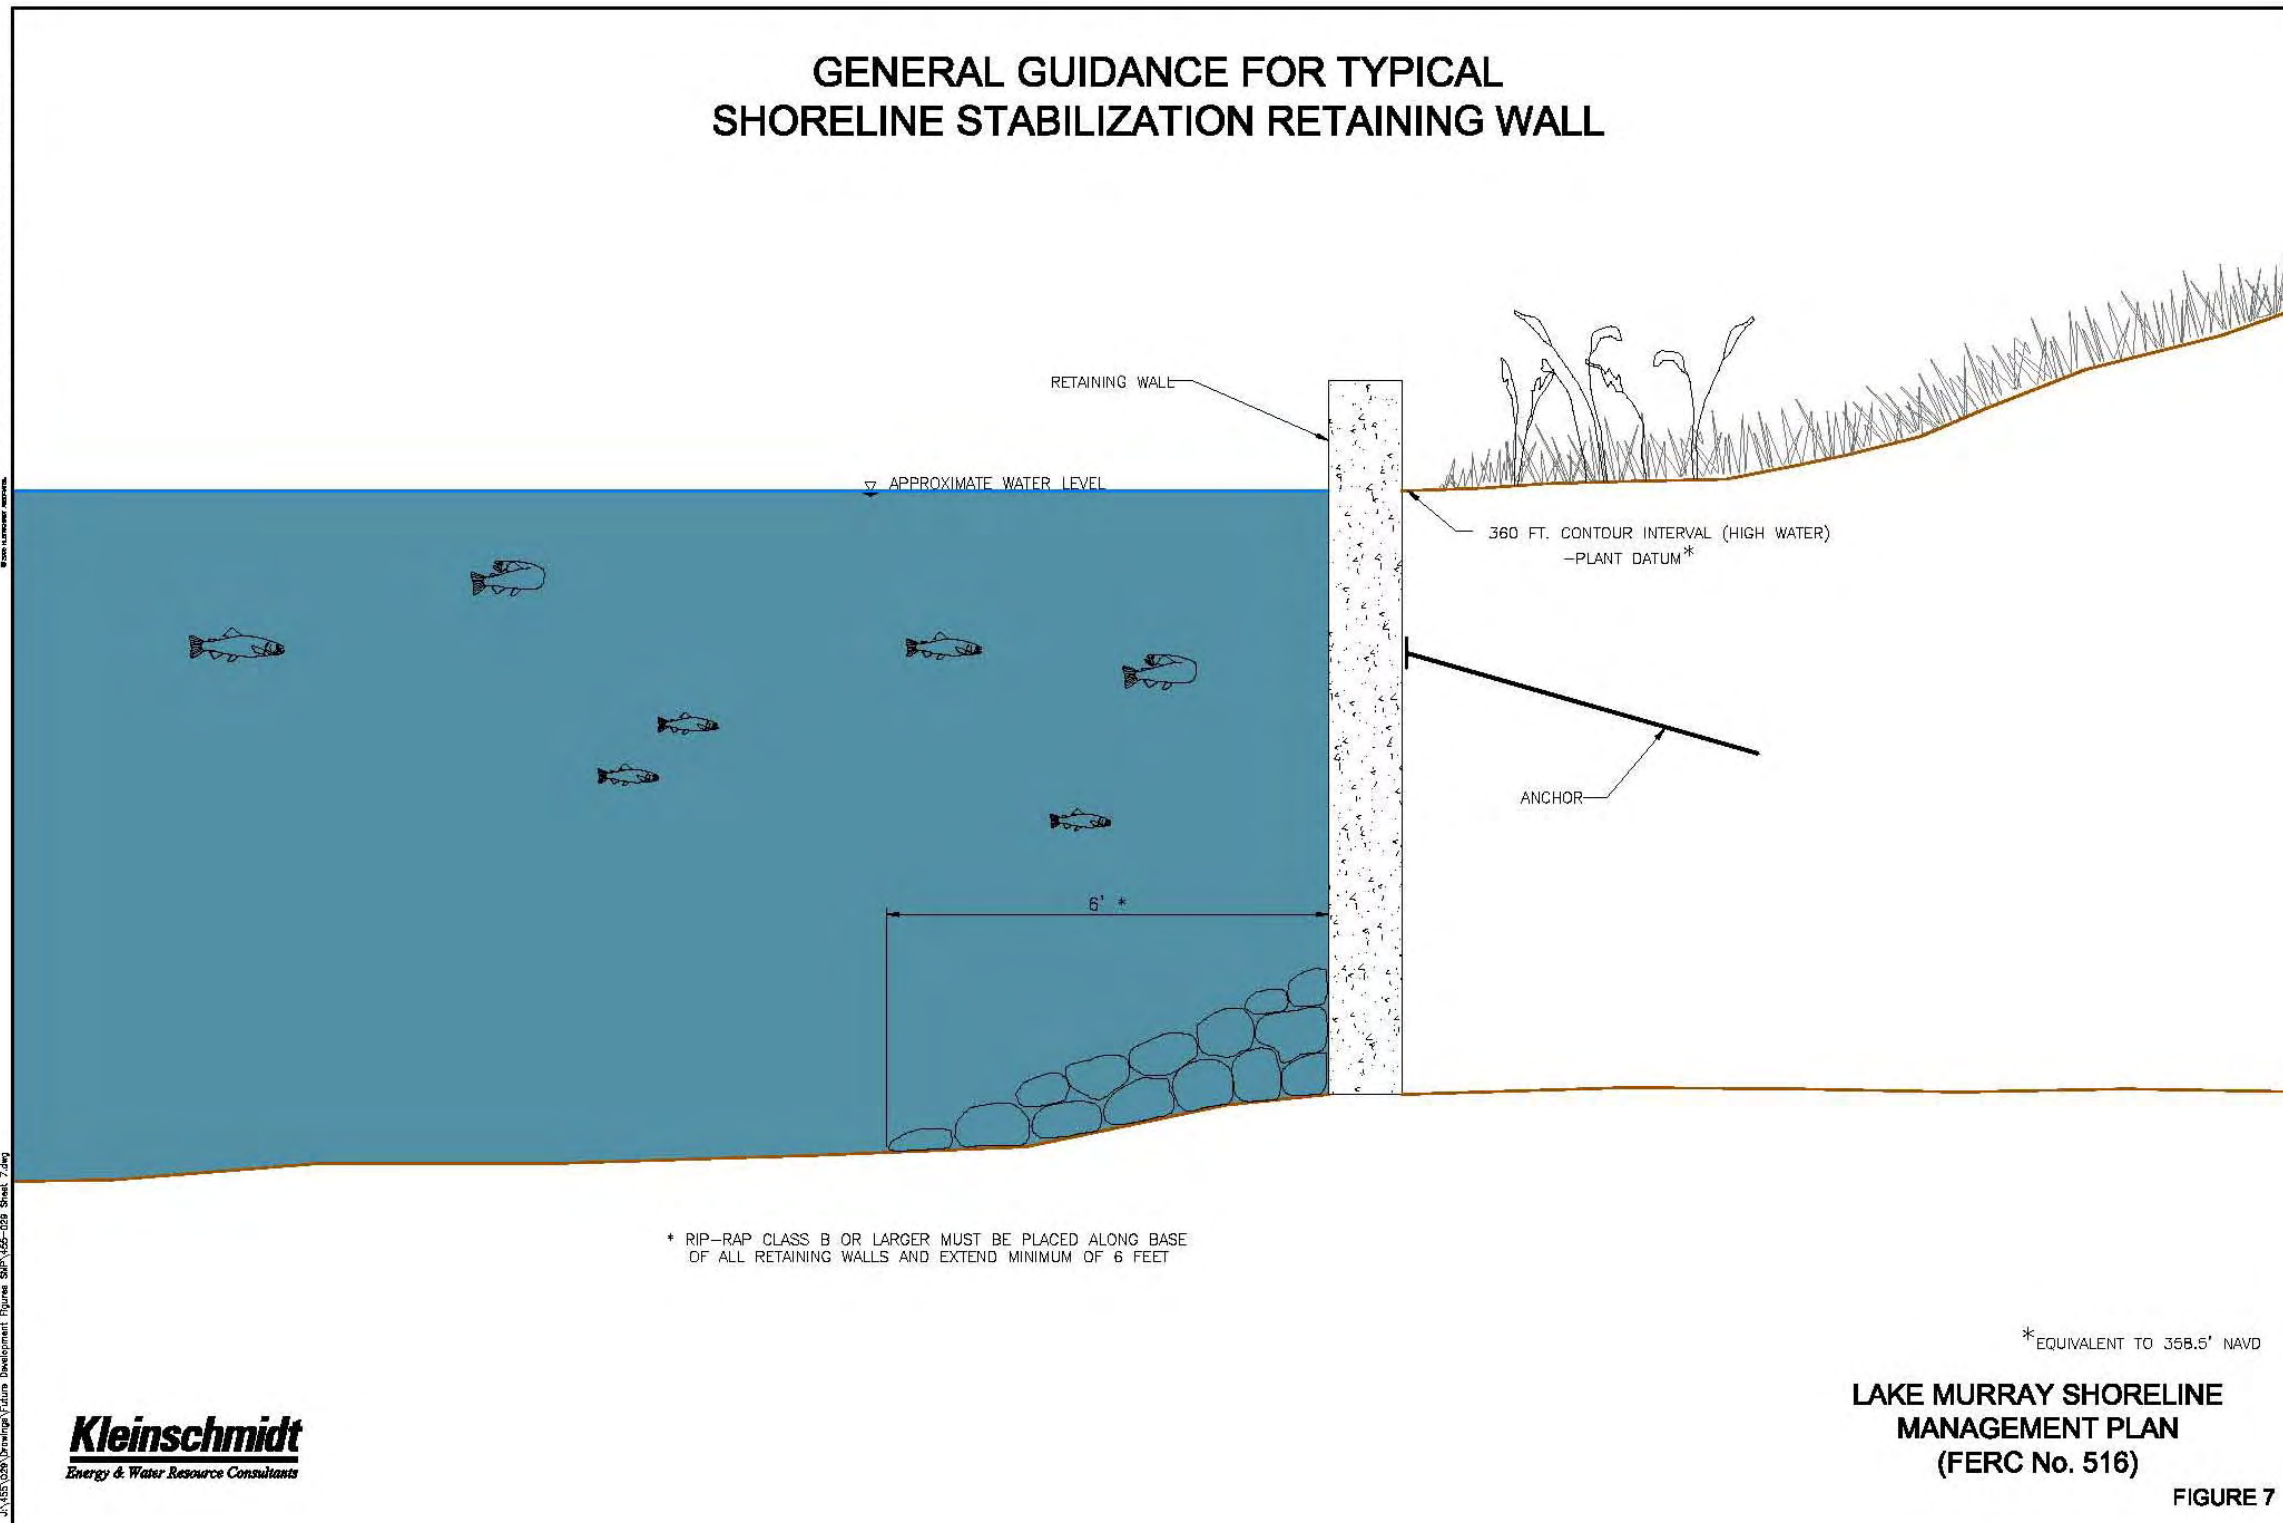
General Guidance for Typical Shoreline Stabilization Retaining Wall
